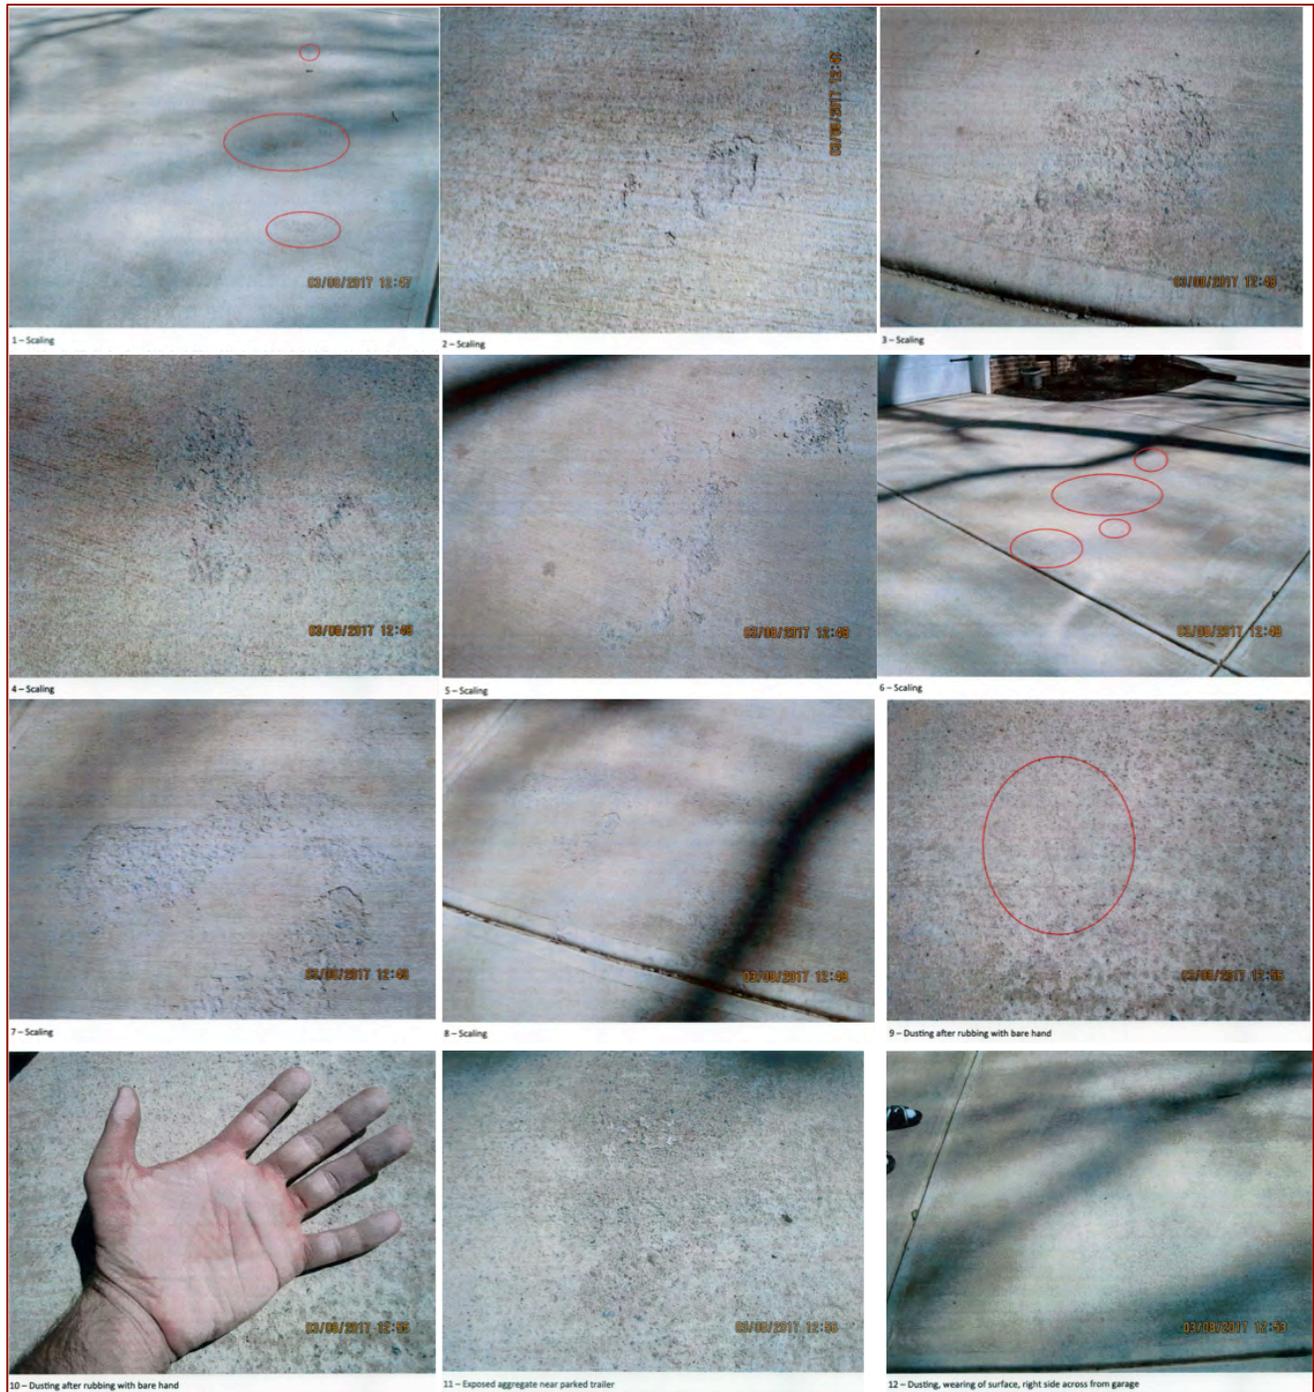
Additional field photographs showing surface scaling and dusting of the concrete driveway slab at various locations.
